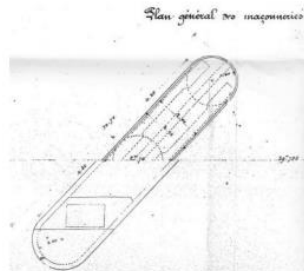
Crucet Bridge: the arrangement of the cast iron tubes and their connections (Courtesy of ACN&P).
